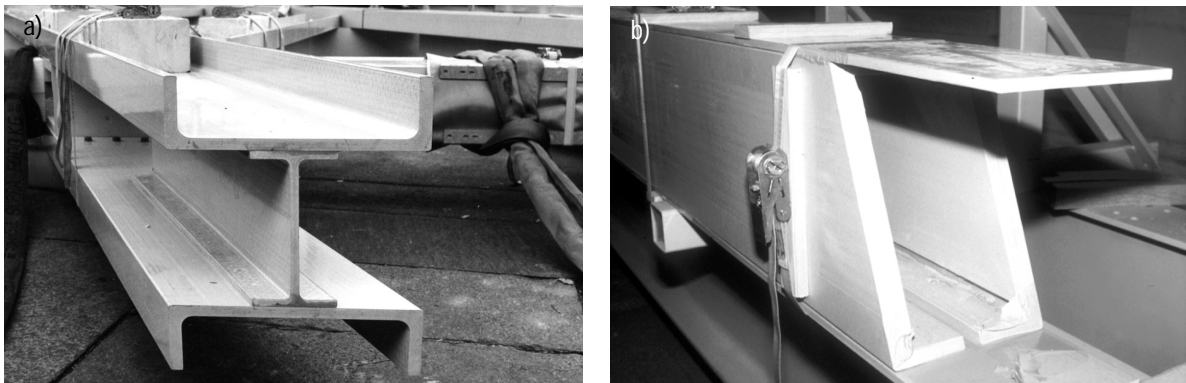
Eyecatcher building (a) open cross-section, (b) closed cross-section manufacture (CCLab)
